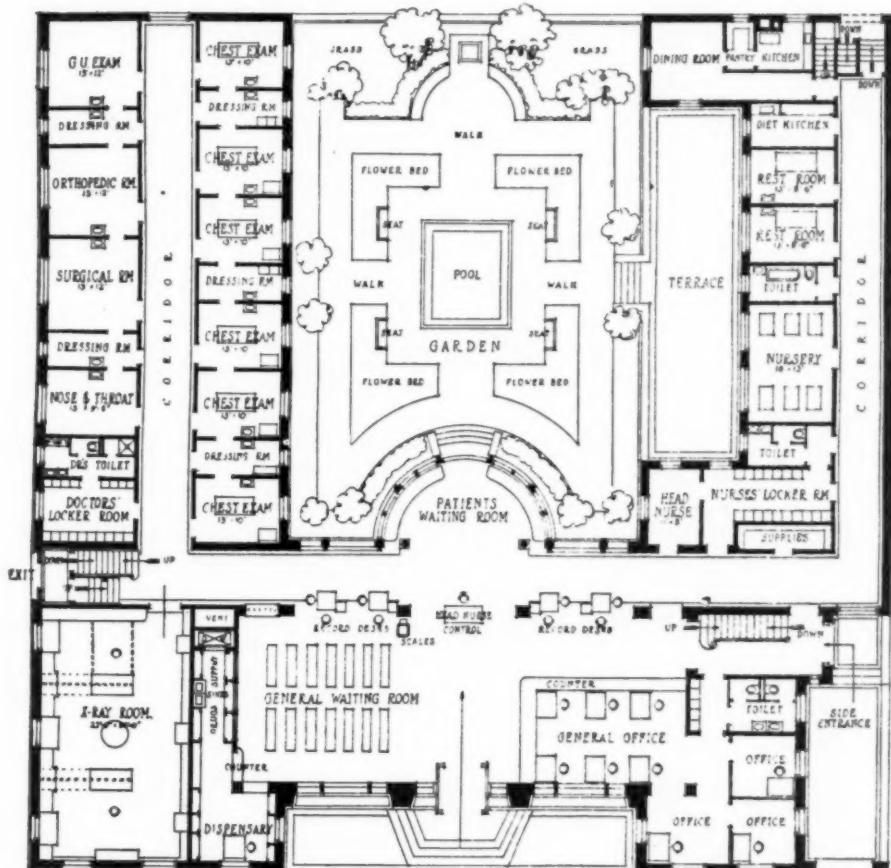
First floor plan of proposed tuberculosis diagnostic stations for Chicago.
